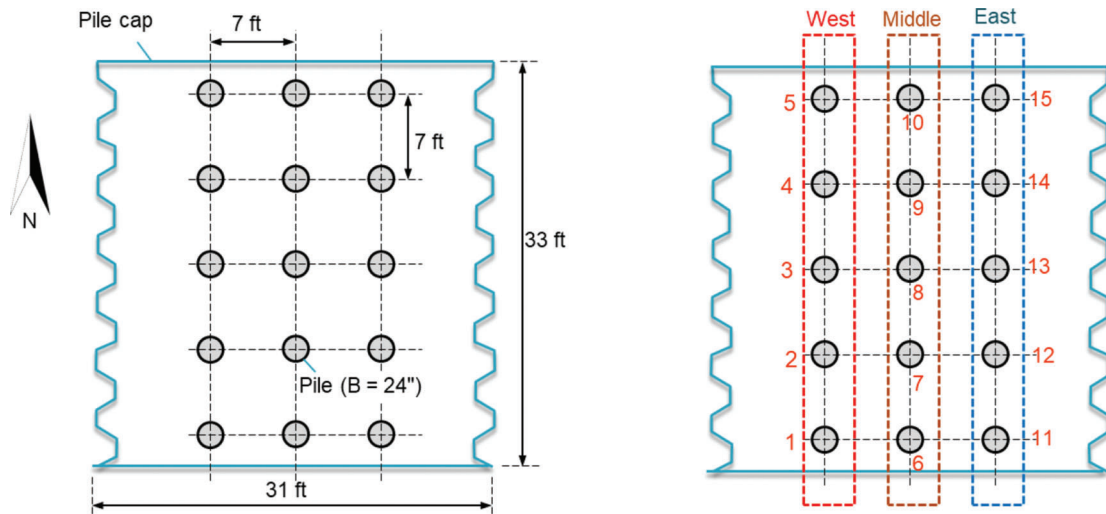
Layout of the pile group and cross section of the pile cap under pier 7.
